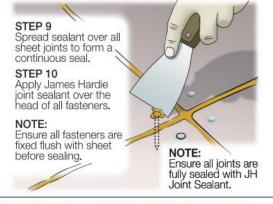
SEAL OVER FASTENERS AND JOINTS
